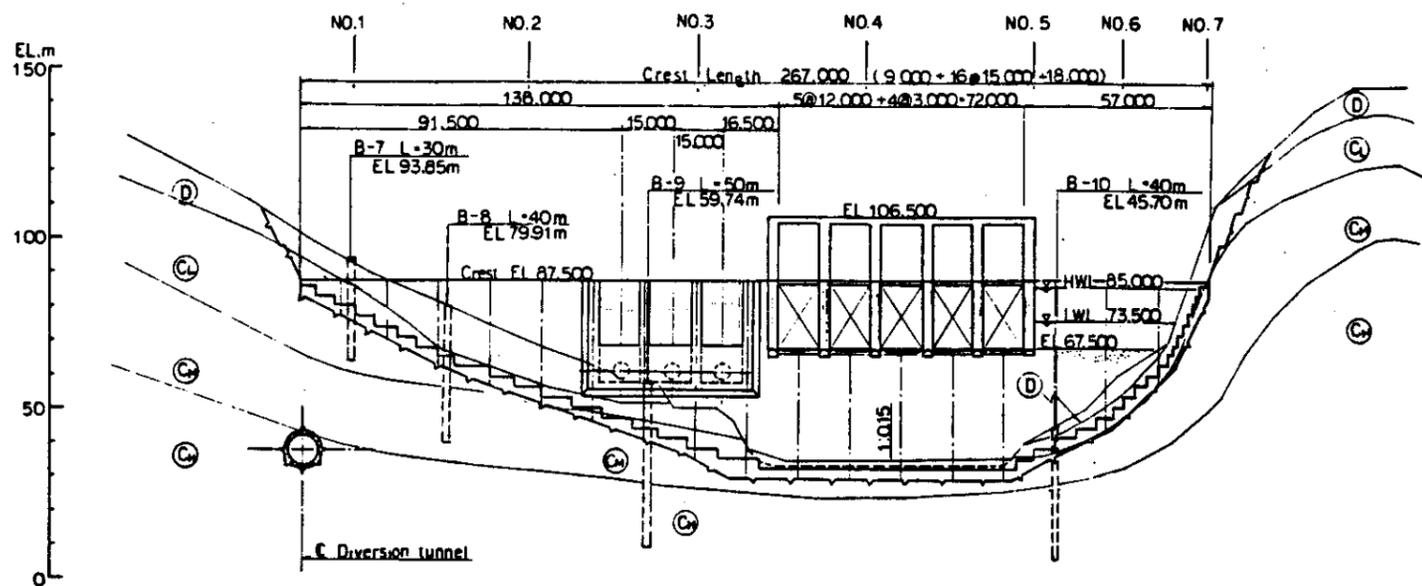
Profile for One-Dam Plan and Two-Dam Plan
